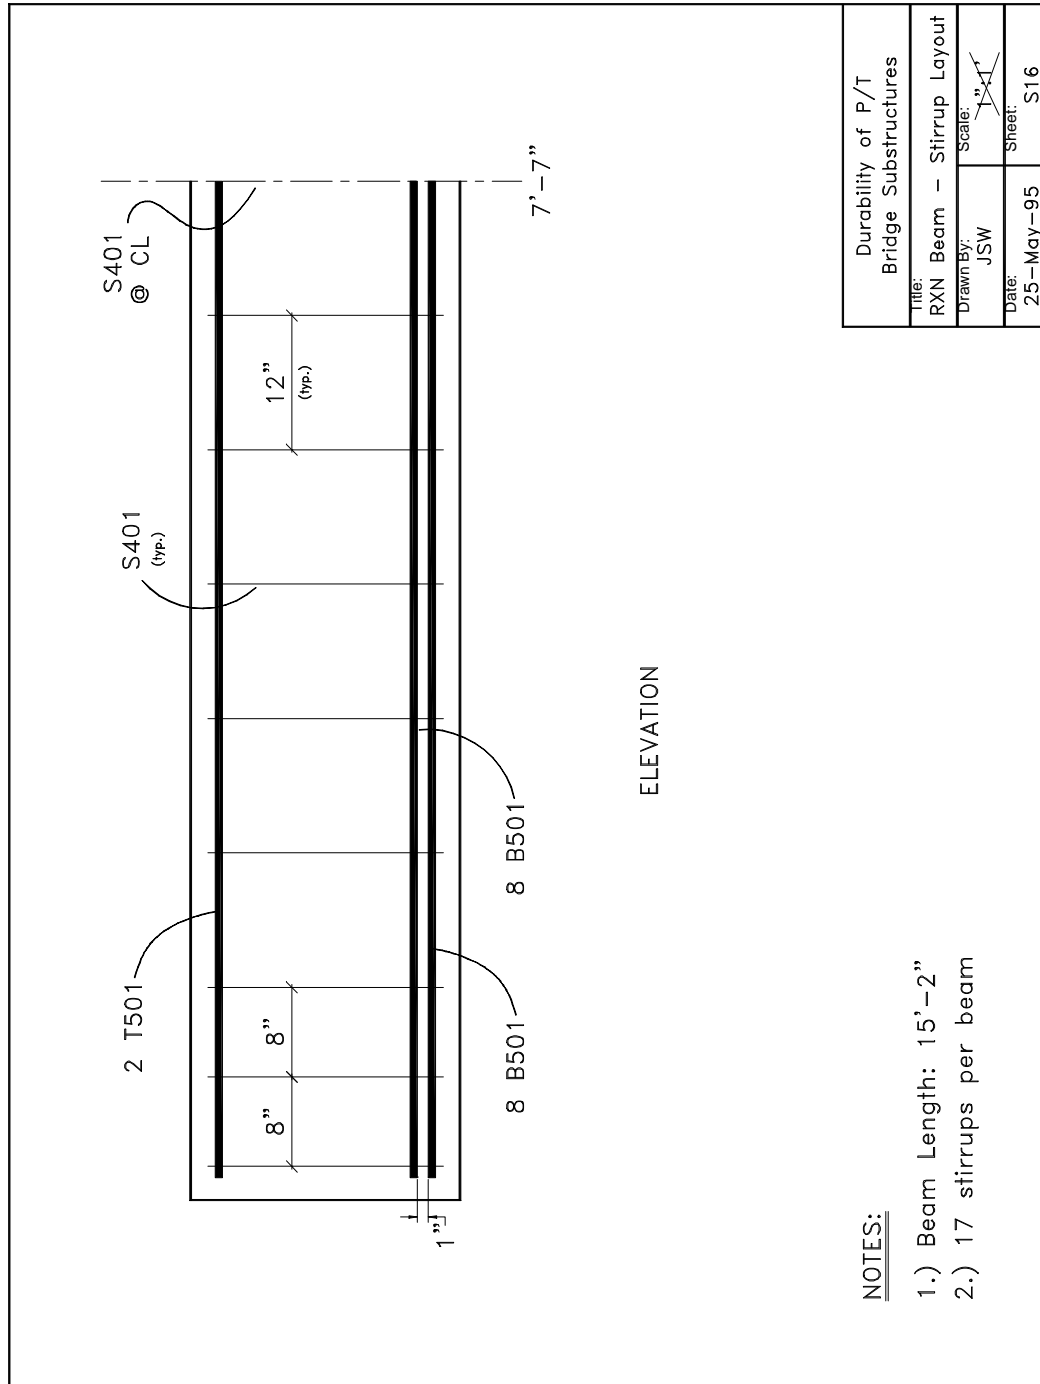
Sheet S16: Reaction Beam Stirrup Layout
